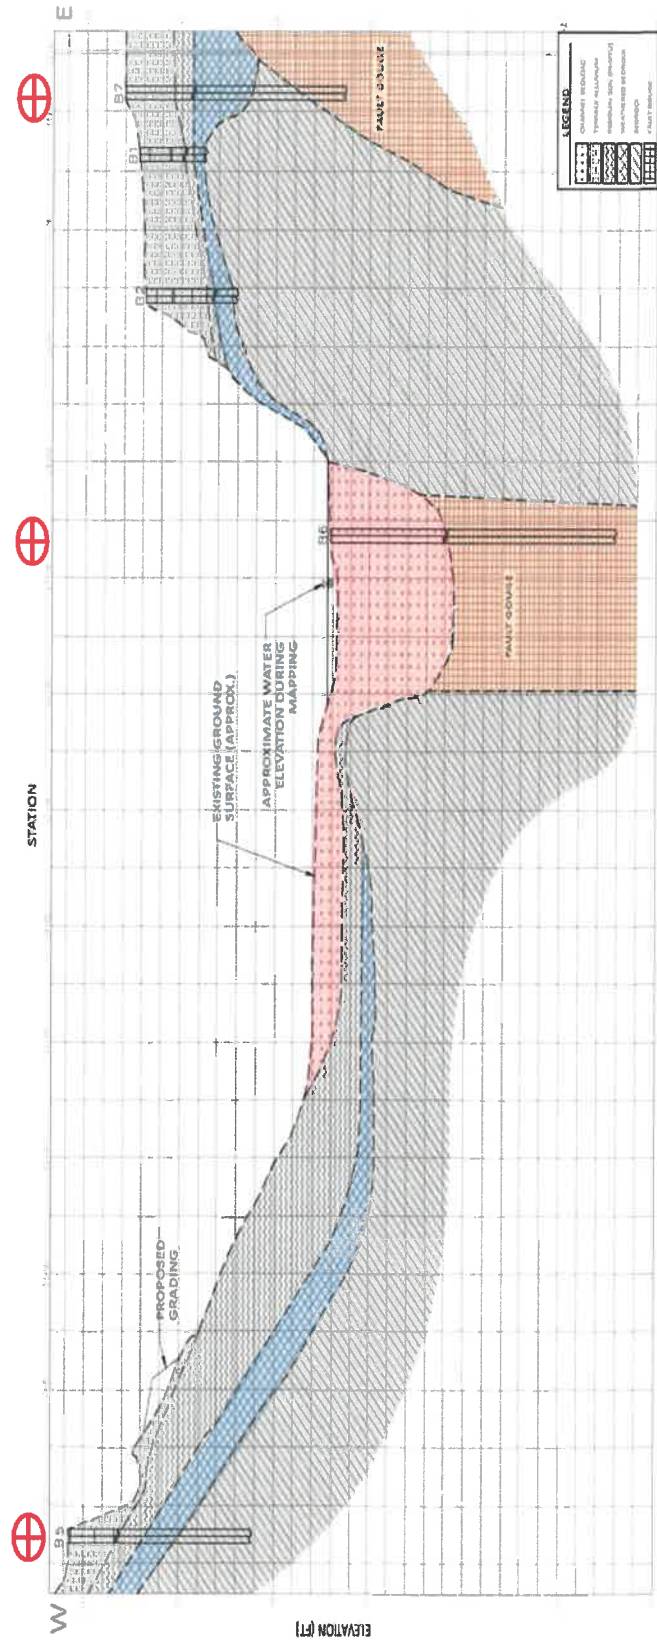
Final geotechnical profile for the crossing of the Mad River
